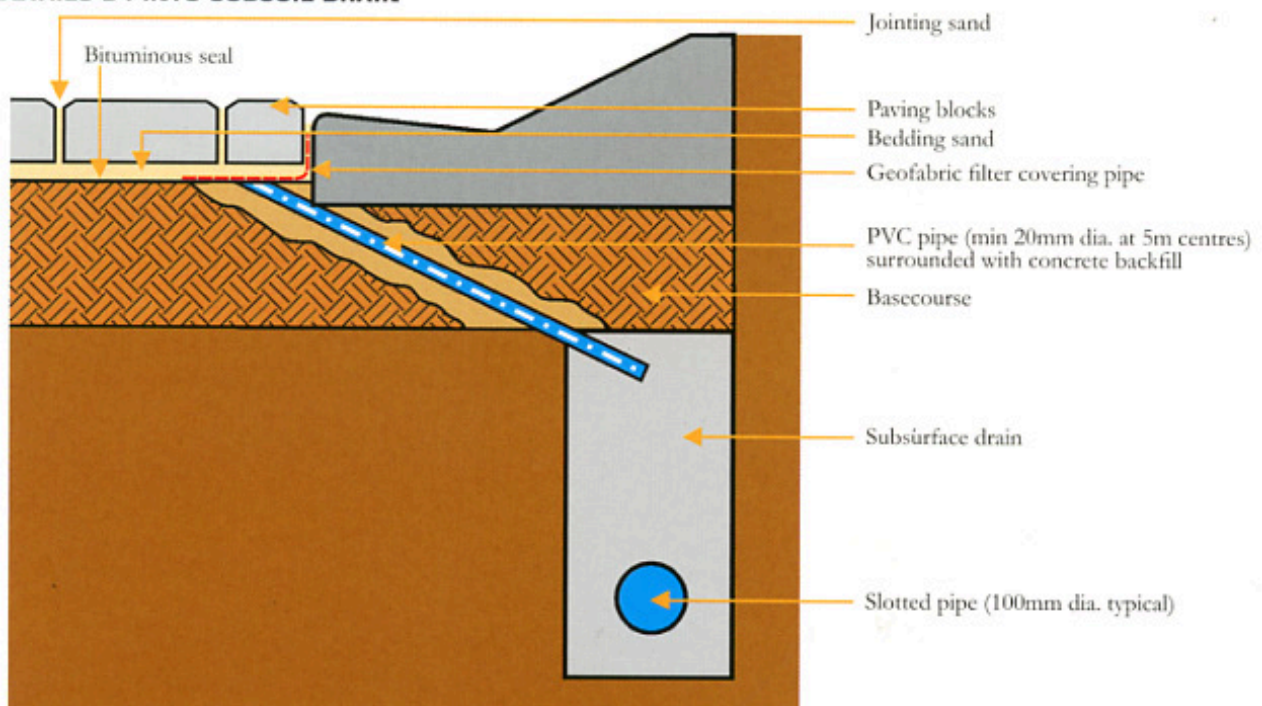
INTO DRAINAGE PITS USING SUB SOIL DRAINS
